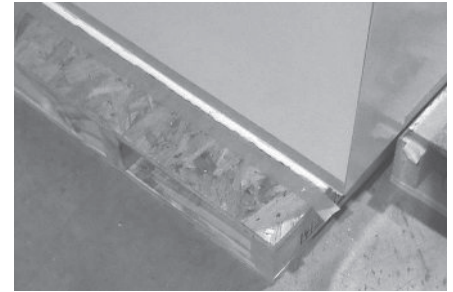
HORIZONTAL SEAM FILLED COMPLETELY WITH SEALANT
